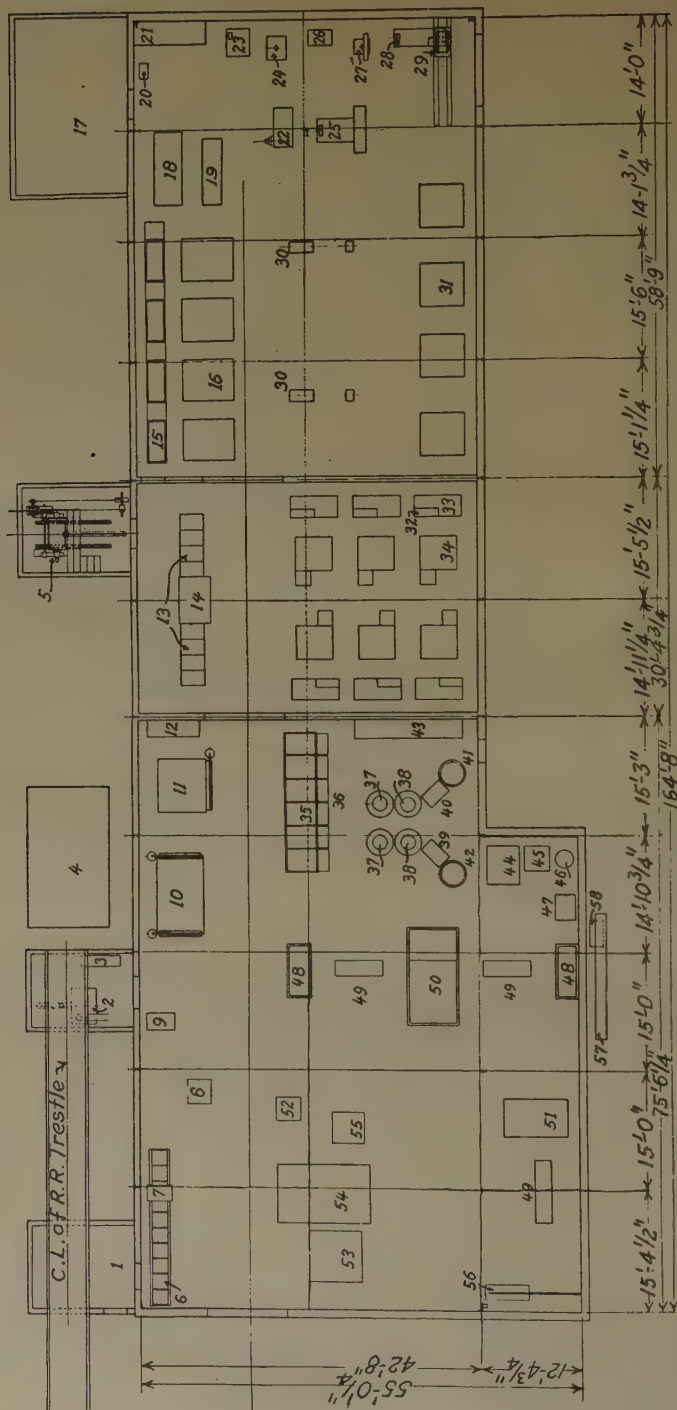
GENERAL LAYOUT OF FURNACE AND MACHINE SHOP BUILDING FOR MANUFACTURE OF HAWKSWORTH BITS AND SHANKS.
